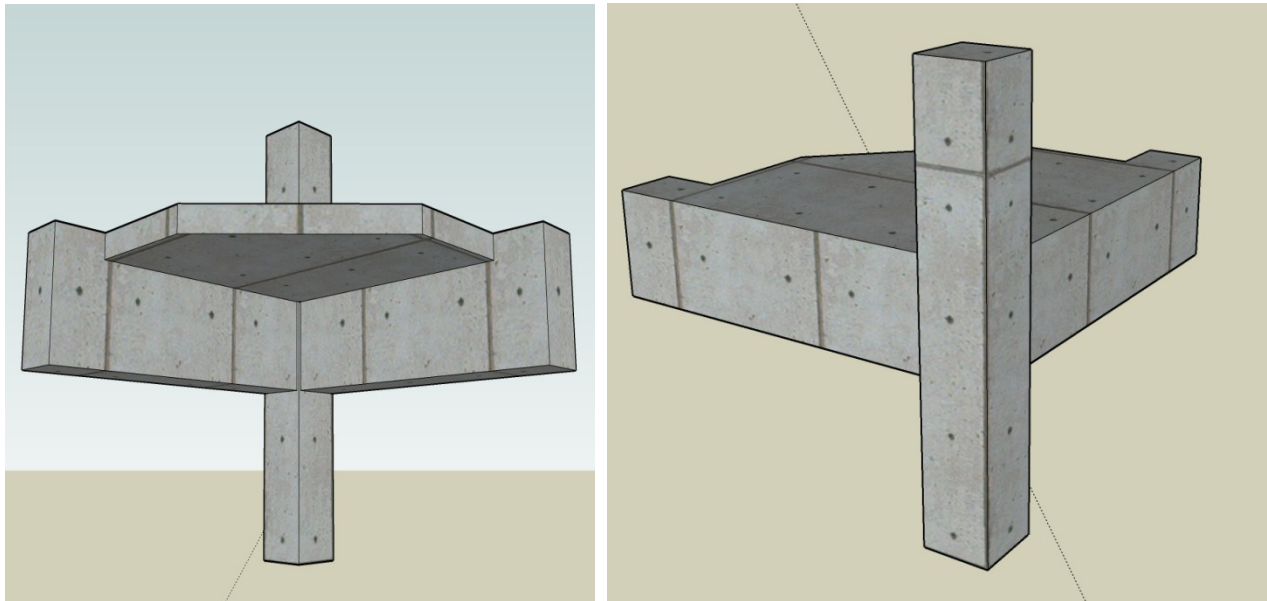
Schematic rendering and concrete dimensions of test specimen
